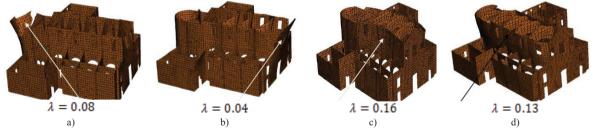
Deformed shapes from FE limit analyses. a) Apse top portion overturning (Y+); b) Façade out-of-plane failure/tympanum rocking (Y-); c) Central nave longitudinal walls overturning(X+); d) Central nave longitudinal walls overturning (X-)
